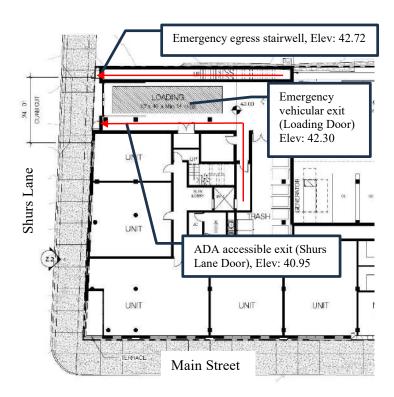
Second floor building access points (per CBP Architect 6/06/24 plans)
